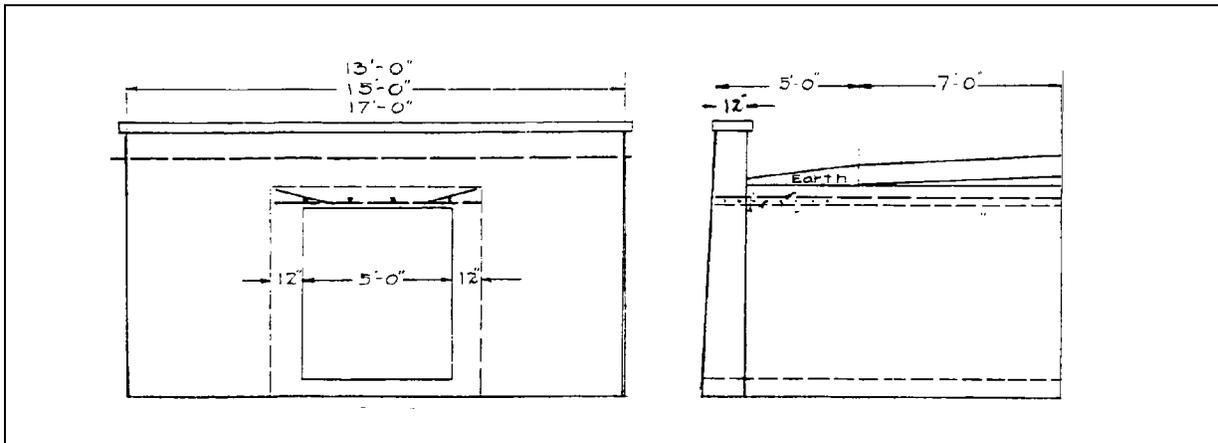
"Steel-concrete" box culvert, 1912 Standard Plans (Source: Maryland State Roads Commission 1912).
